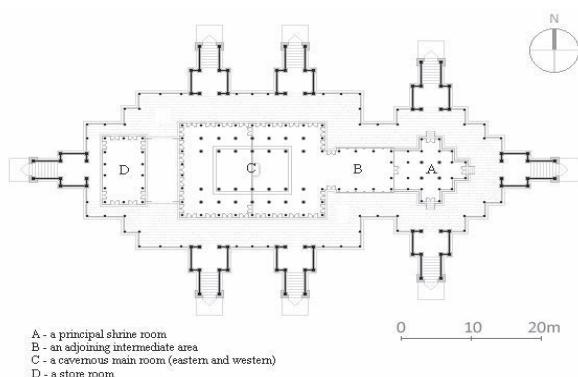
A Typical Plan Layout of Wooden Monastery^{*1}
